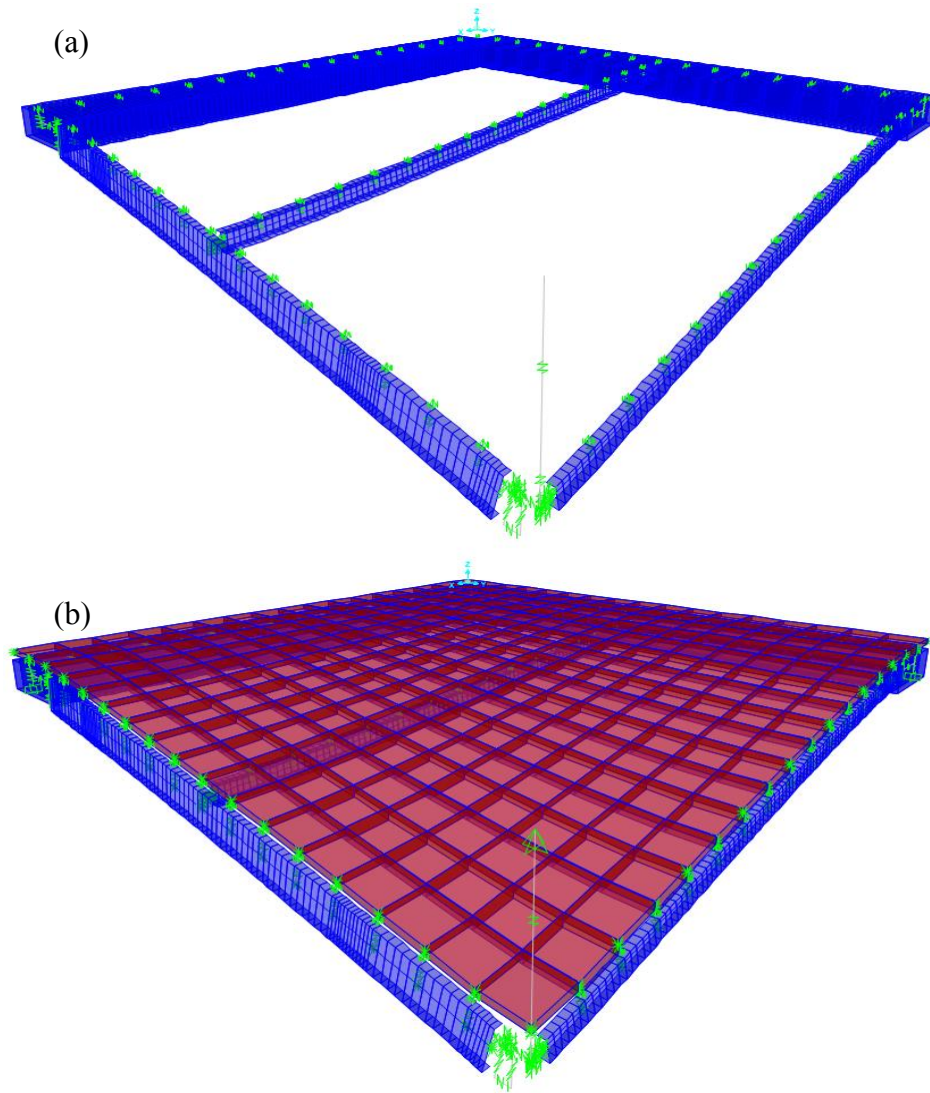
Deflected shapes of simplified SAP2000 models: (a) bare steel frame model; (b) fully composite steel-reinforced concrete floor system model
